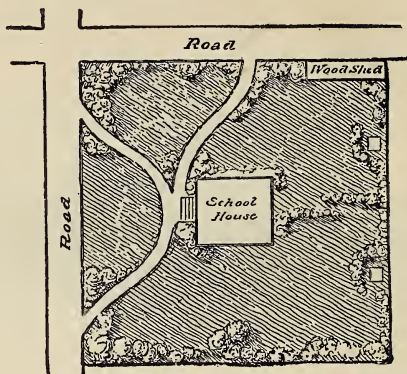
A "corner" schoolhouse and how the grounds may be arranged
